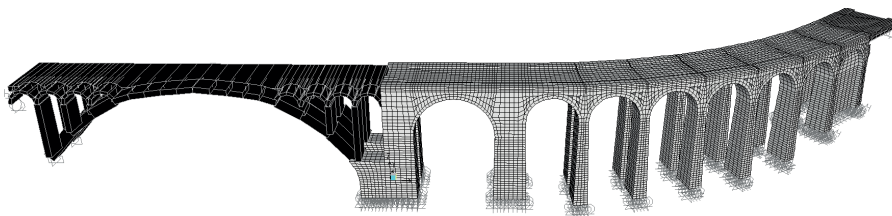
The Finite Element model of the bridge right bank and main arcade
